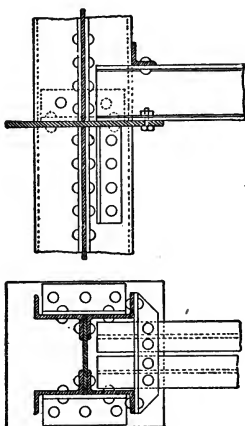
Detail of Z-bar Column Splice. Monadnock Building.
